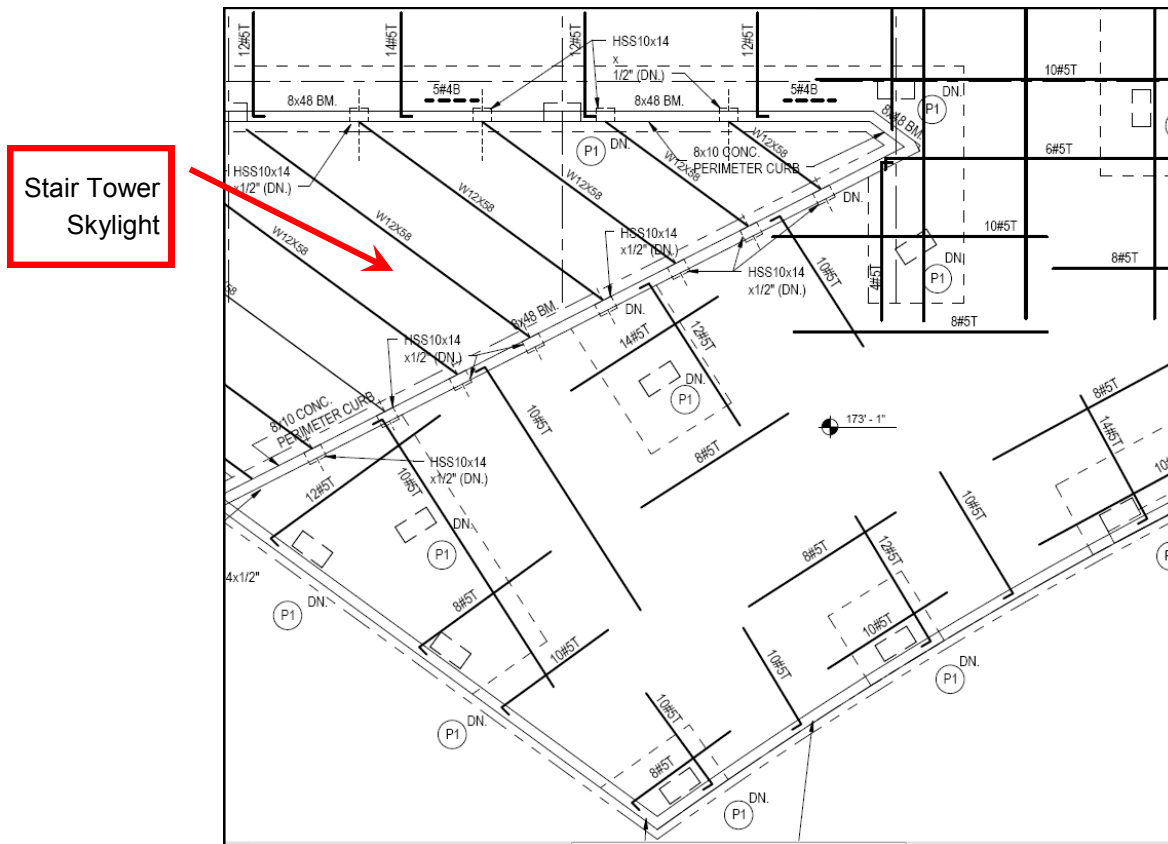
Integrations of both steel and concrete systems on roof, taken from drawing S1.11
